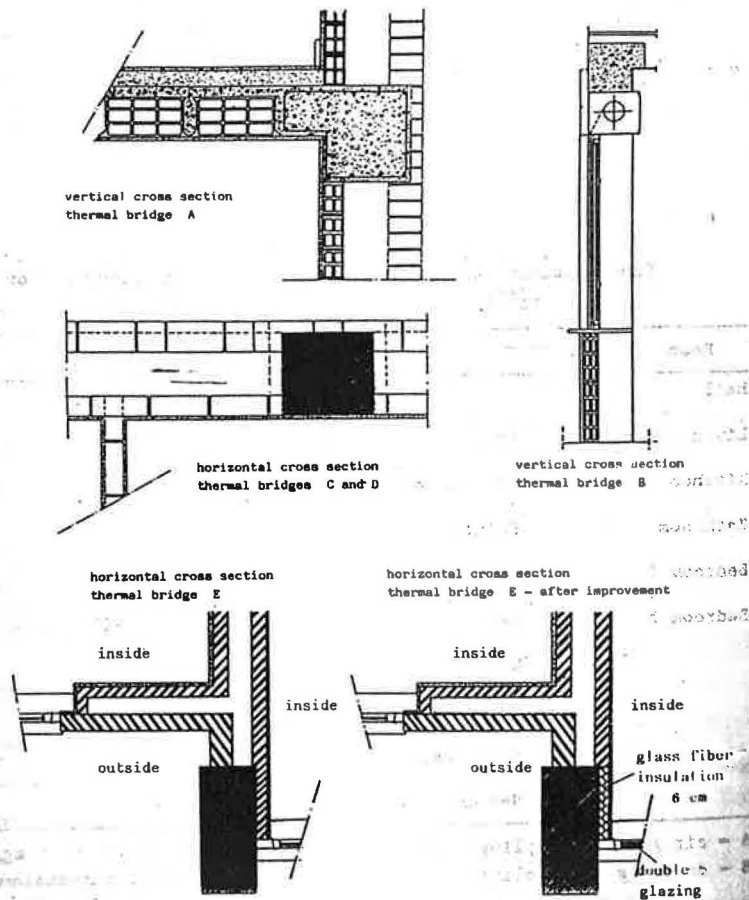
Cross sections of some thermal bridges (IACP dwellings)
